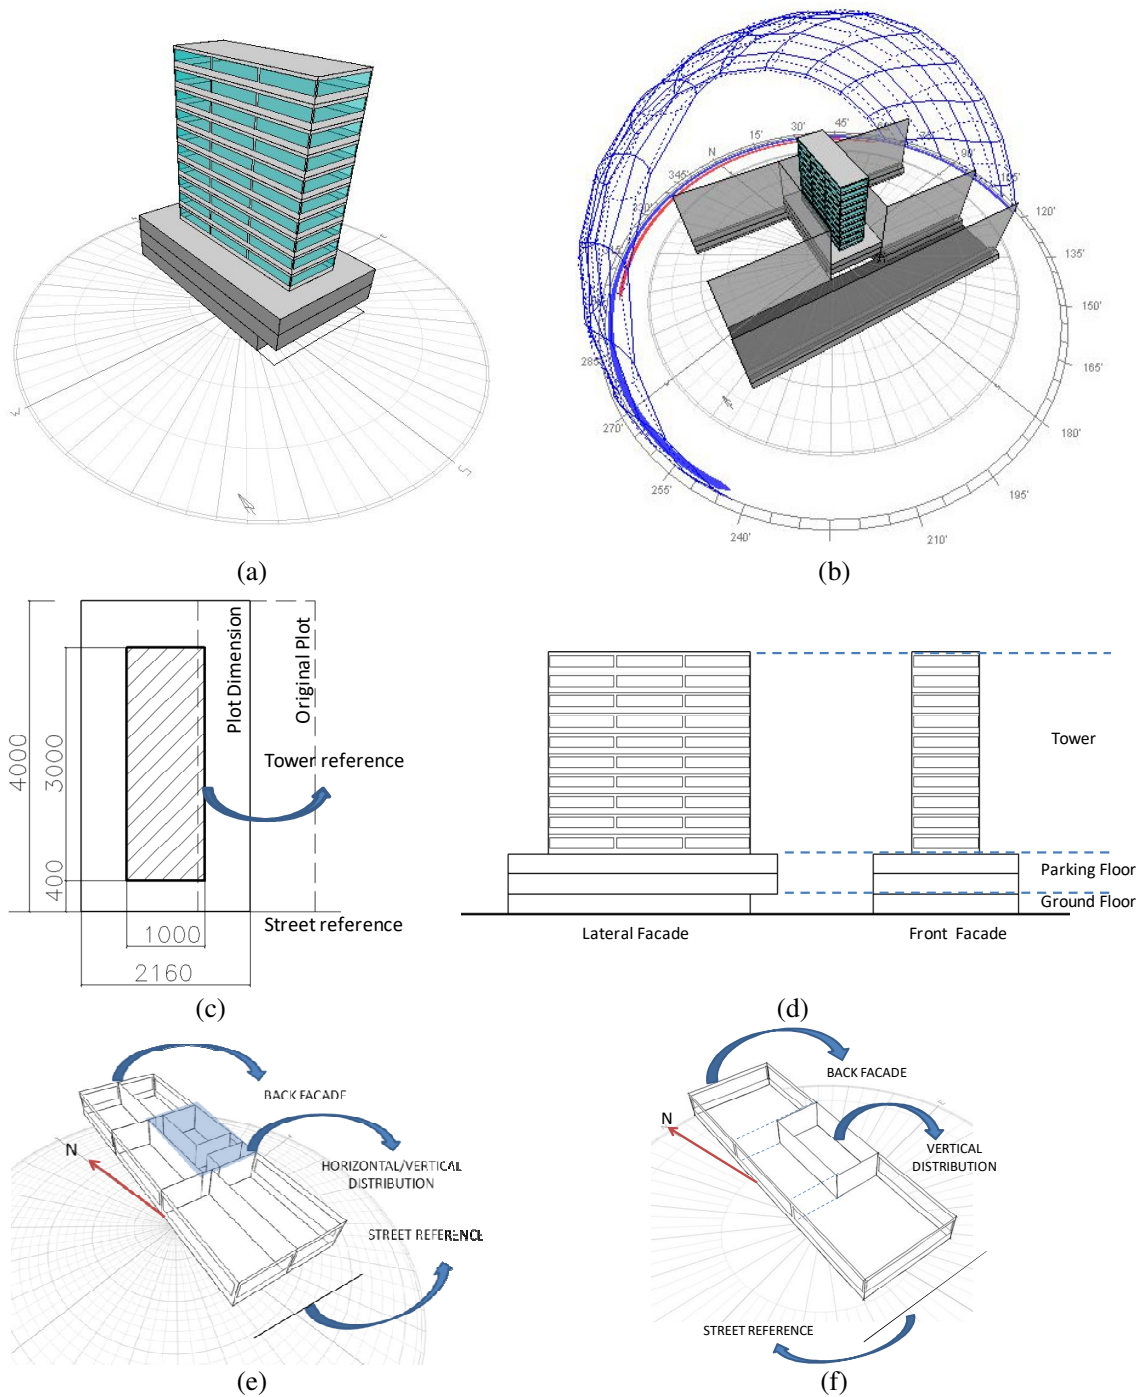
(a) Archetype III_A and III_B geometry, (b) Urban Context, (c) Site plan, (d) Lateral and Front Facade references, (e) Floor Subdivision Archetype III_A, (f) Floor Subdivision Archetype III_B
